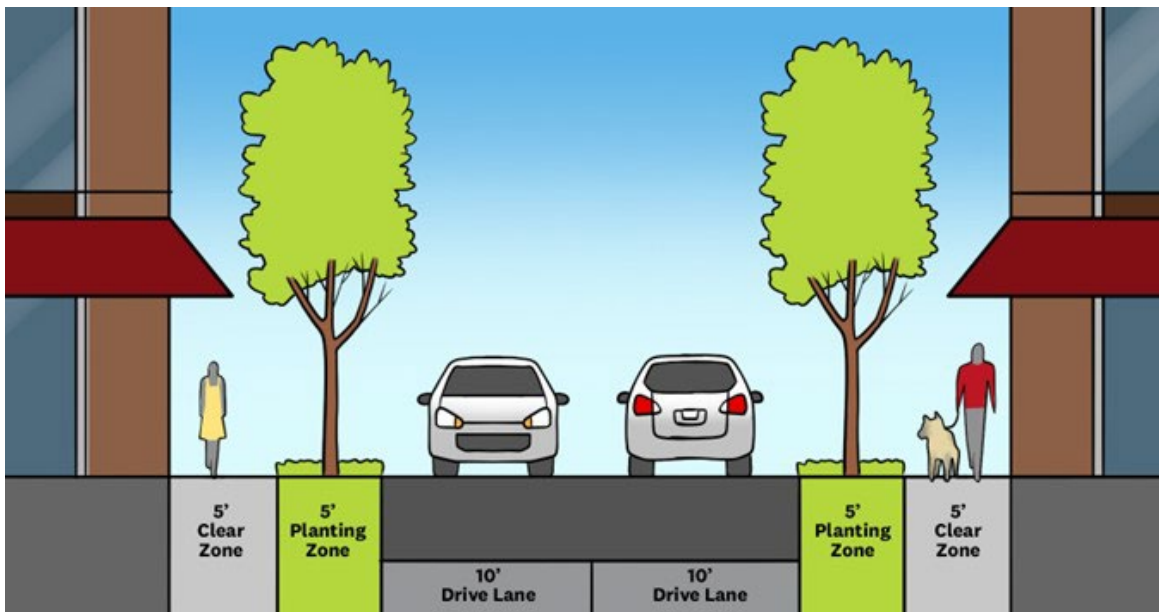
[Internal Circulation Route](#) Option 4 Cross Section
